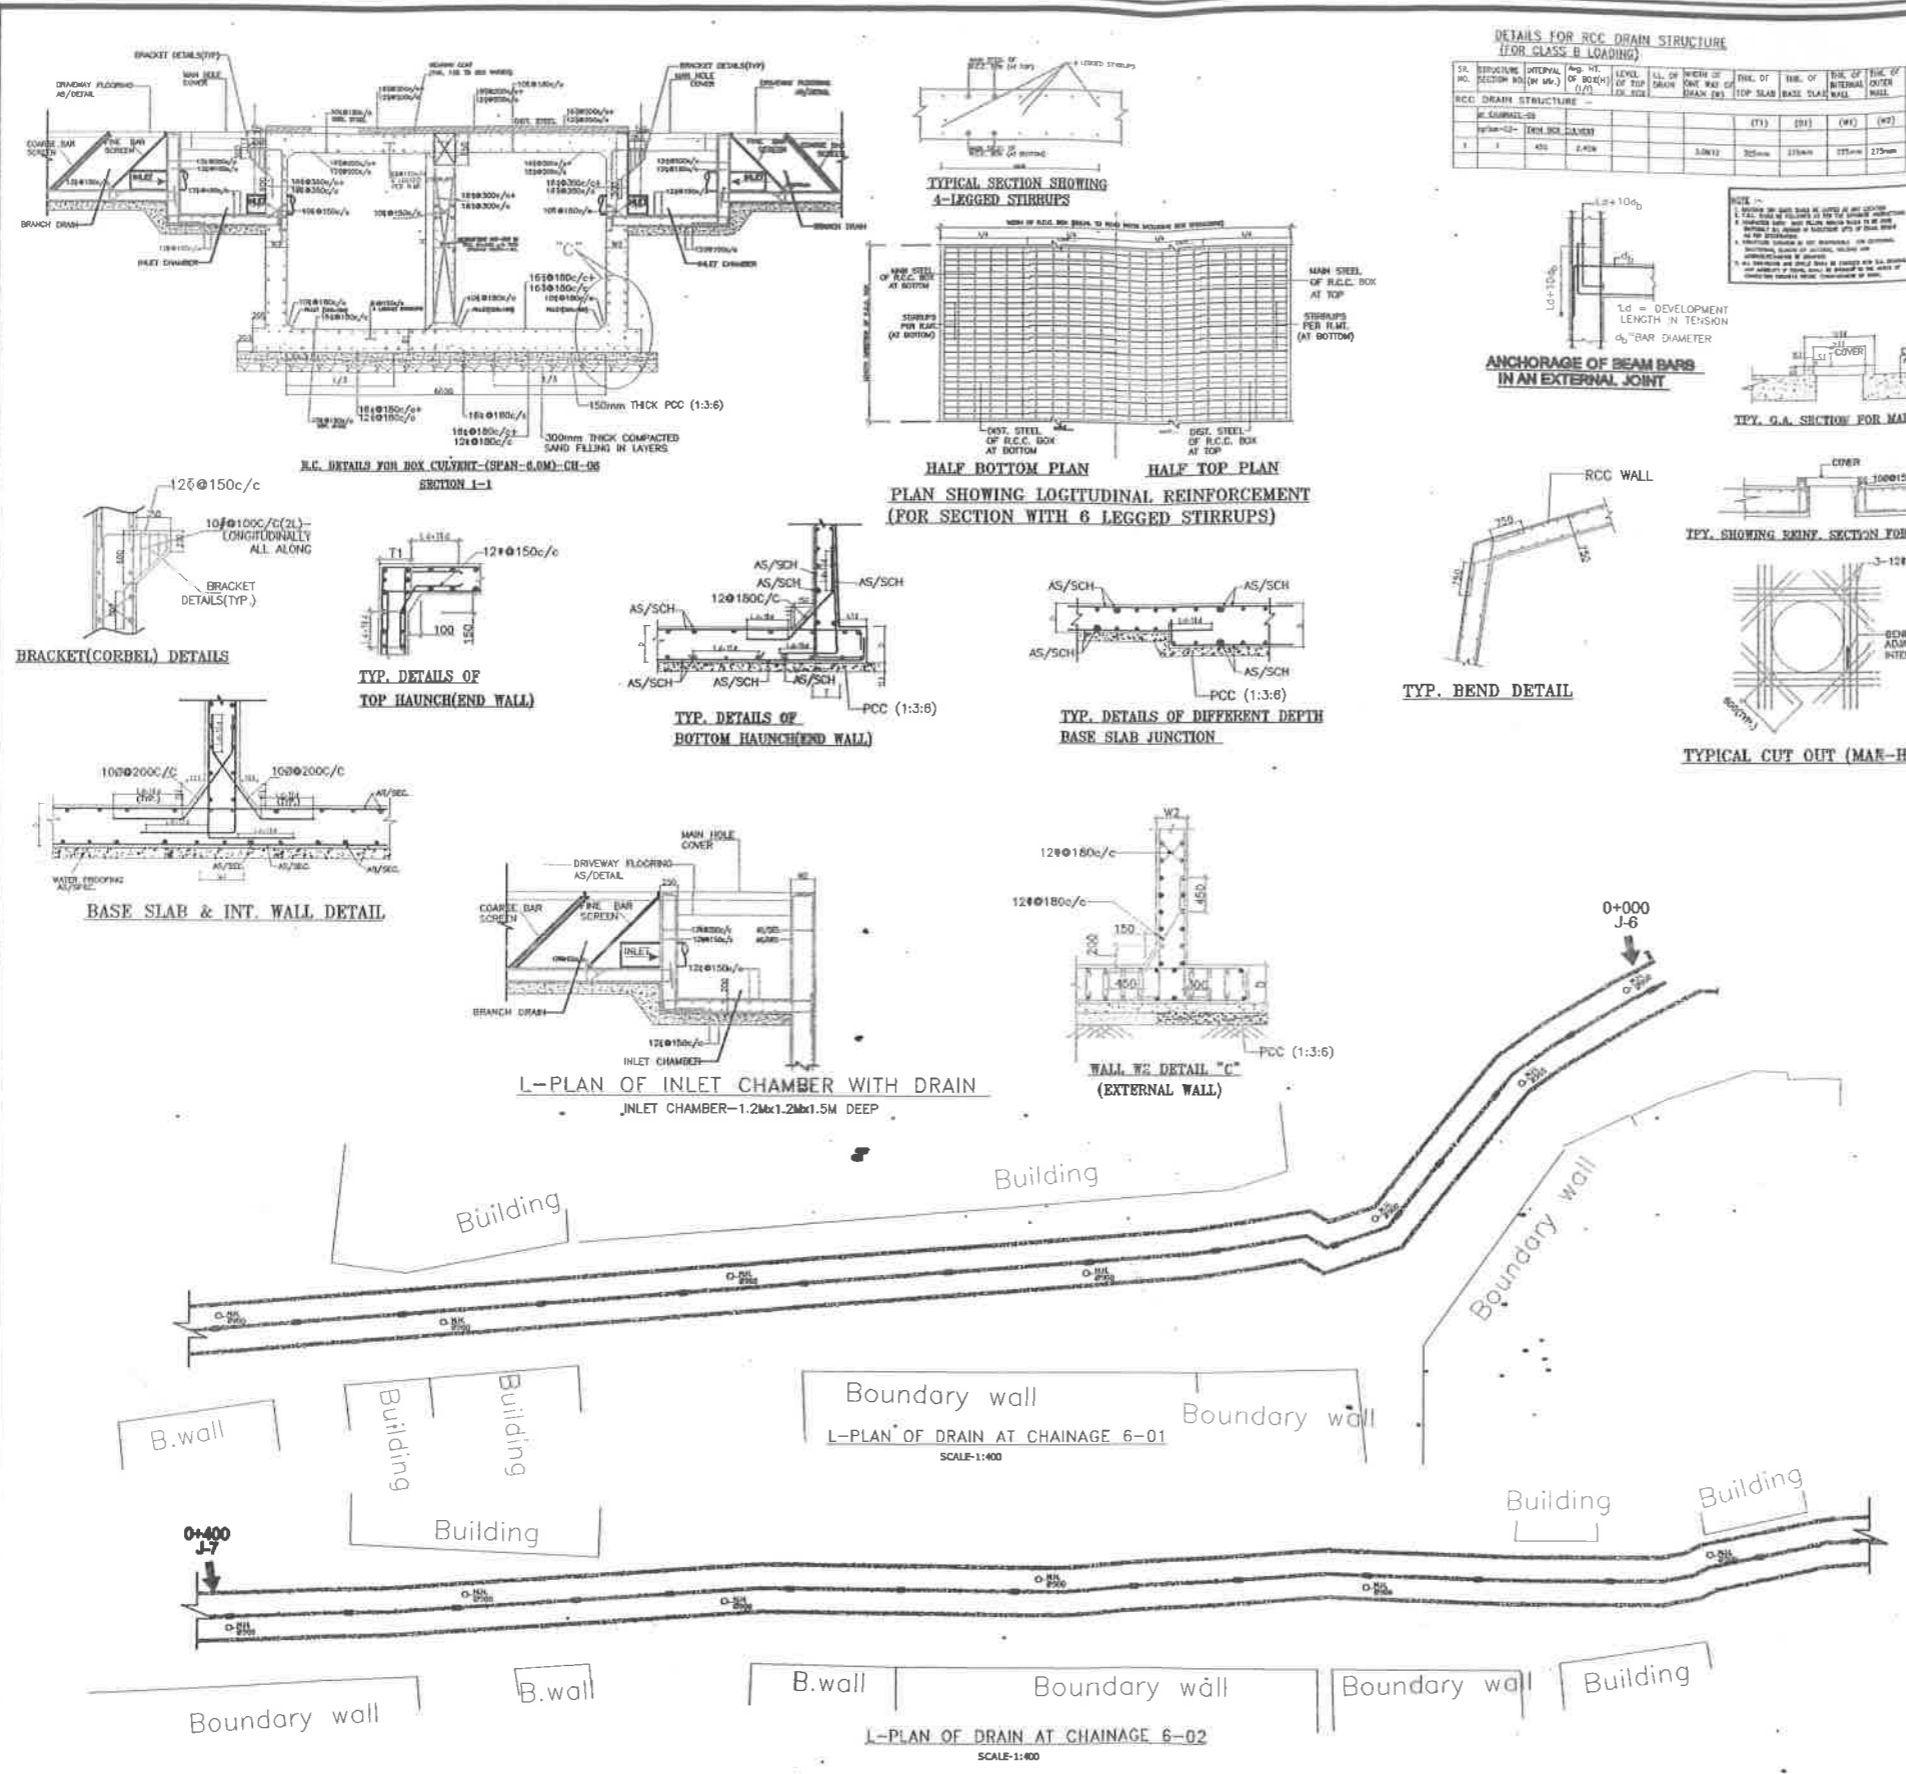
DETAILS FOR RCC DRAIN STRUCTURE (FOR CLASS B LOADING)
